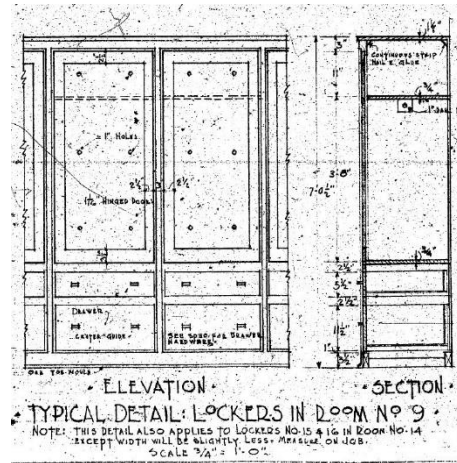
Drawing of built-in lockers in locker room (W. Horace Austin, Sheet 3)
